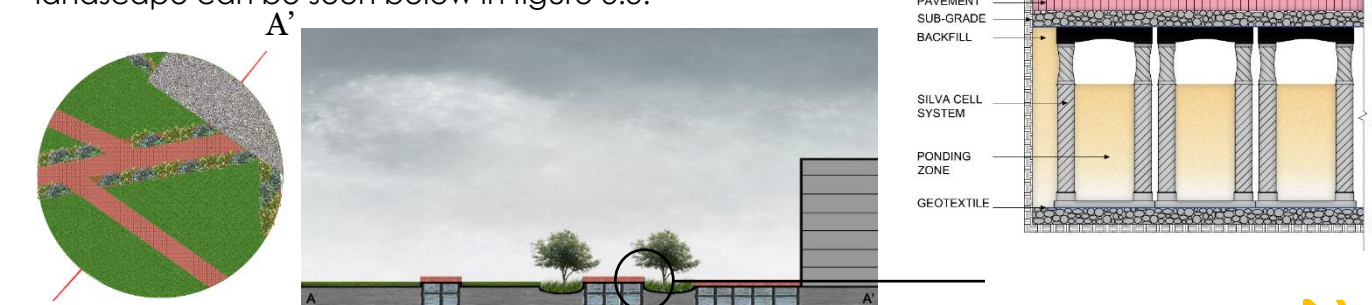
(Left to Right) Part Landscape Plan, Site Section, Silva Cells Section
